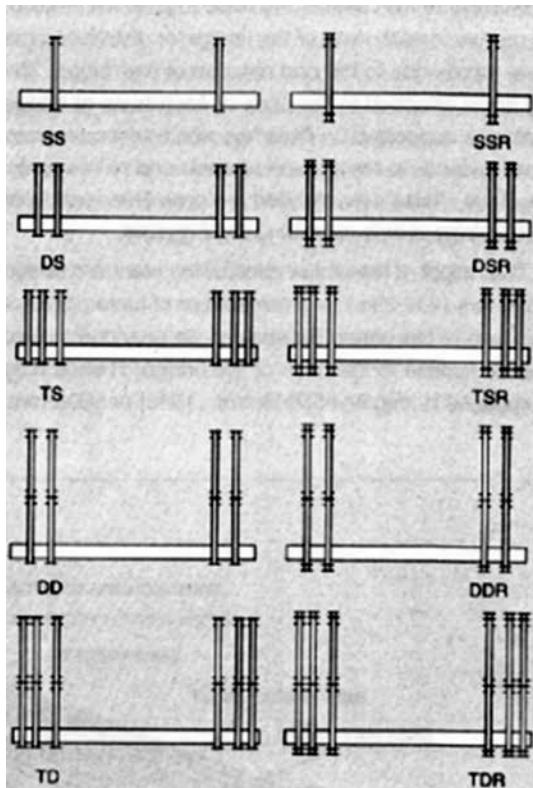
Bailey Bridge Configuration of Trusses and Storeys
